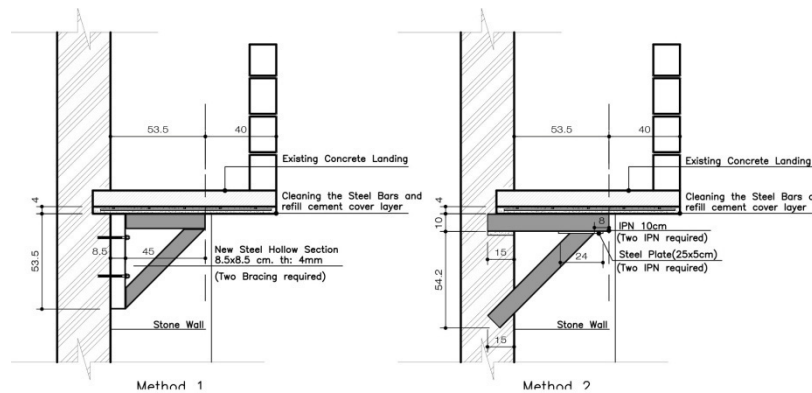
Detailed drawings showing two methods of using the steel brackets attached to the concrete balconies (Hammoud J., 2021)
